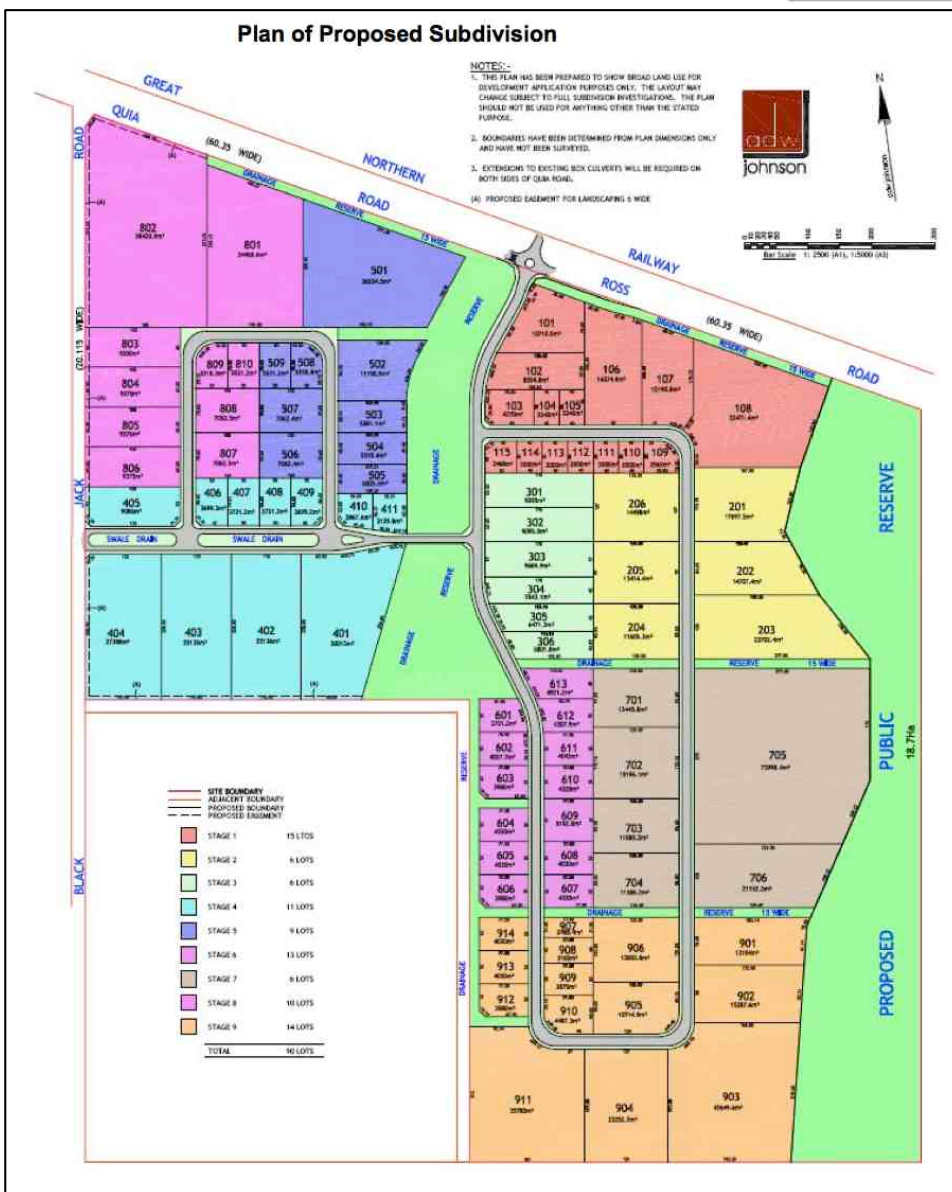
Black Jack Road North West Business Park Proposed Subdivision Plan
